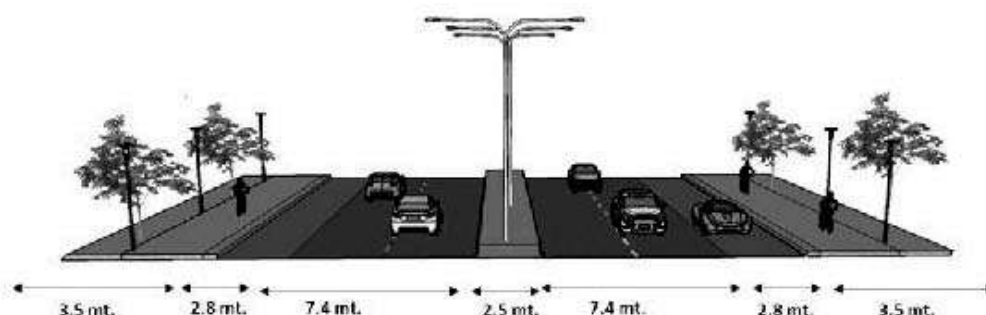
Cross Section of 30m wide Sub-Arterial Road
